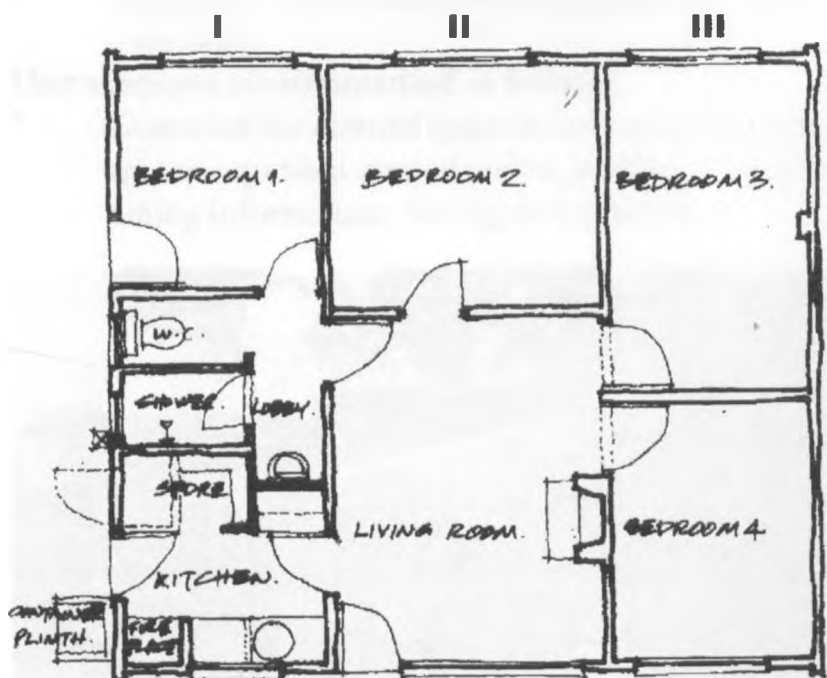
Typical Floor Plan. Could be done in three phases.
